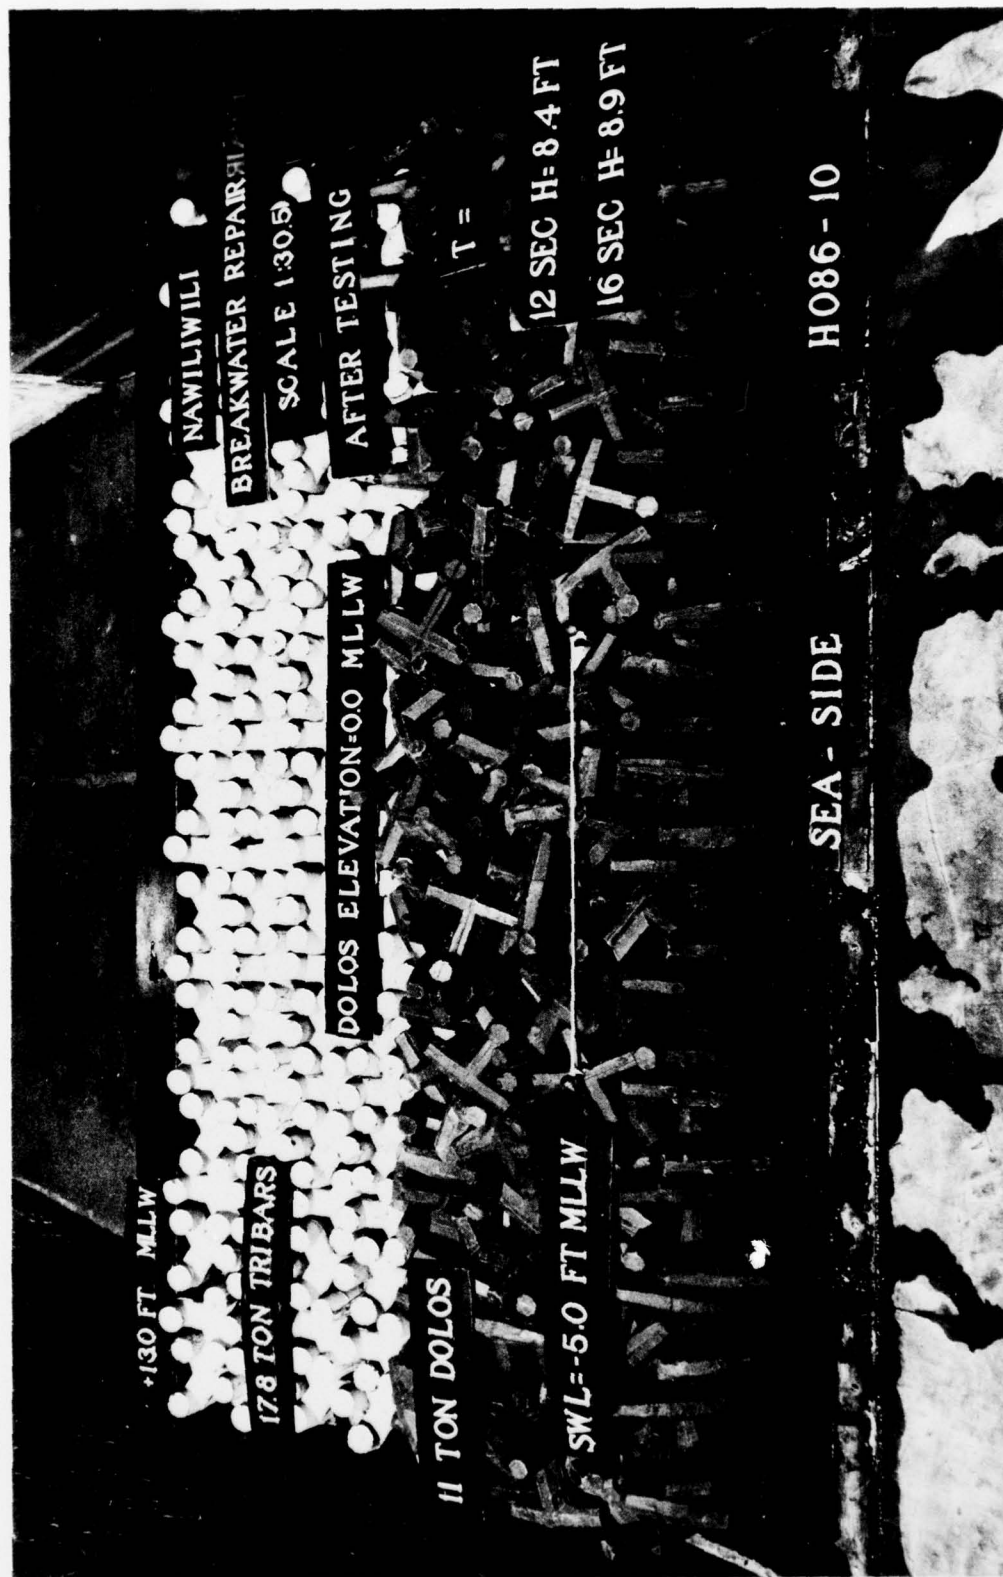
Sea-side view of test section 1A after testing with 12-sec, 8.4-ft and 16-sec, 8.9-ft waves at the -5 ft mllw swl
